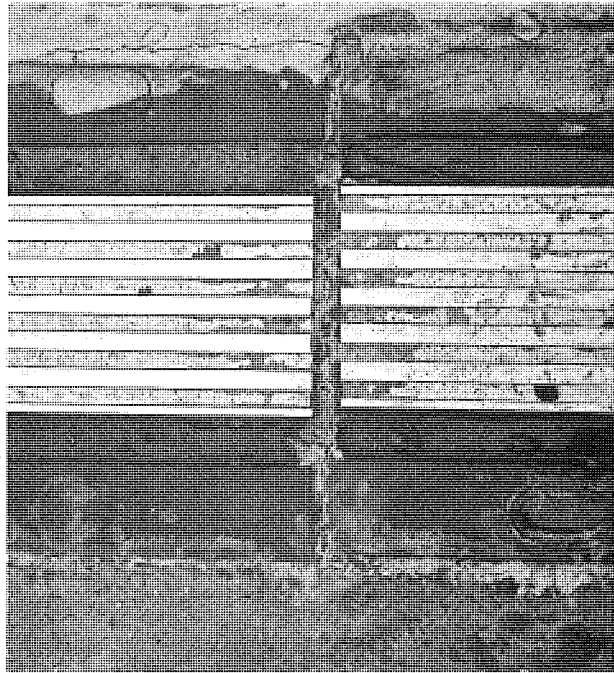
Waboflex SR2.5 (CS 82-240). Horizontal misalignment of sections and not tightly abutted.
